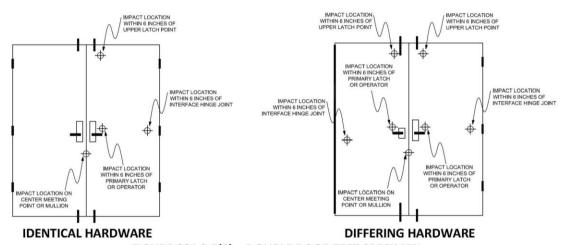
(2) – DOUBLE DOOR TEST SPECIMEN
